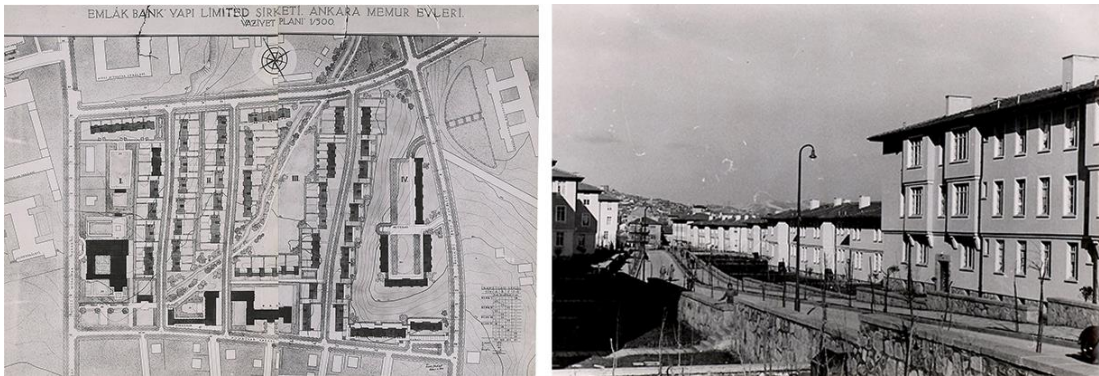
Saraçoğlu Mahallesi’s plan and street elevation. (Source: Bonatz, P. (1946). *Emlak Bank Yapı Limited Şirketi Ankara Memur Evleri Vaziyet Planı.*)
